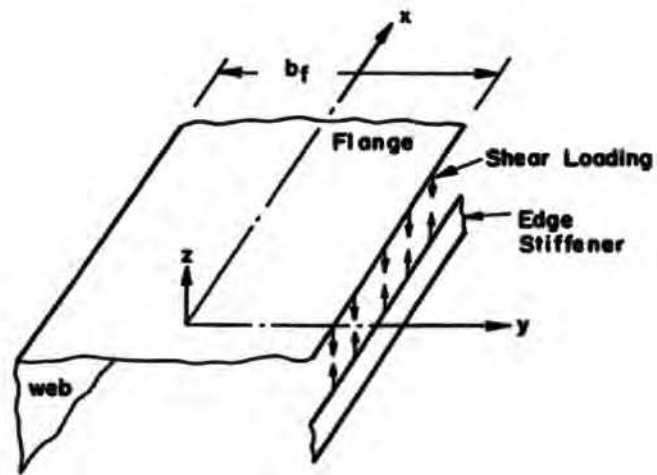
SHEAR LOADING AT FLANGE-STIFFENER JUNCTION
